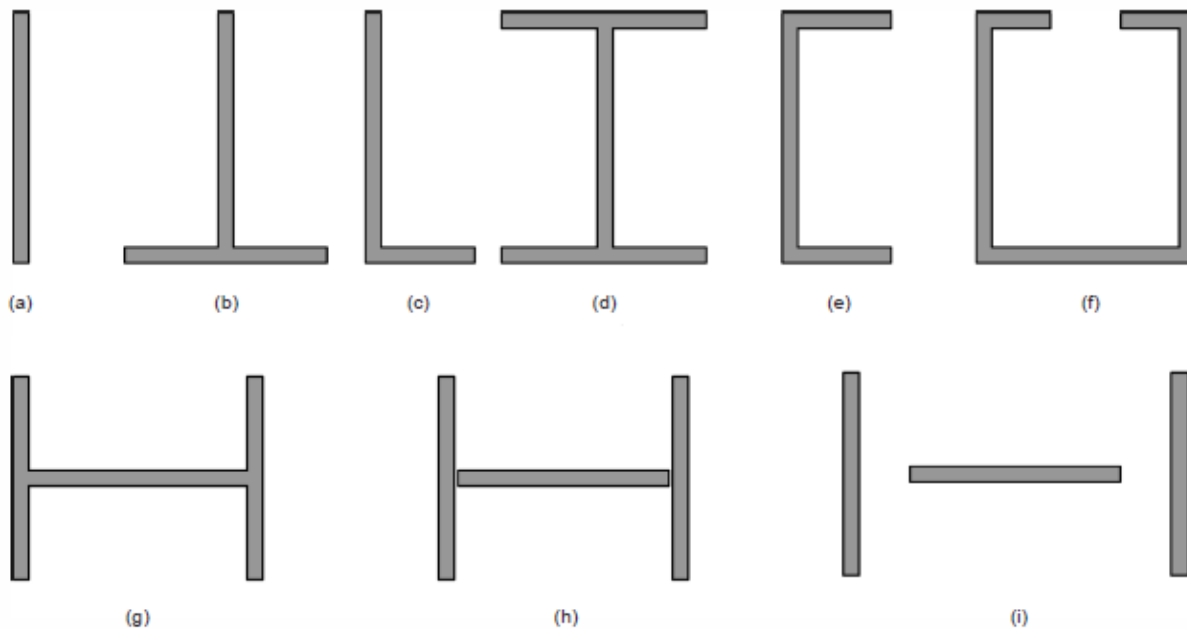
Plan configurations of walls: (a) typical shear wall, (b) T-shaped flanged wall, (c) L-shaped flanged wall, (d) I-shaped flanged wall, (e) C-shaped flanged wall, (f) box-section or core wall with an opening, (g) I-shaped wall with full continuity between web and flanges, (h) I-shaped wall with disconnected web and flanges and stiff coupling from floors, (i) I-shaped wall with flexible coupling from floors.
